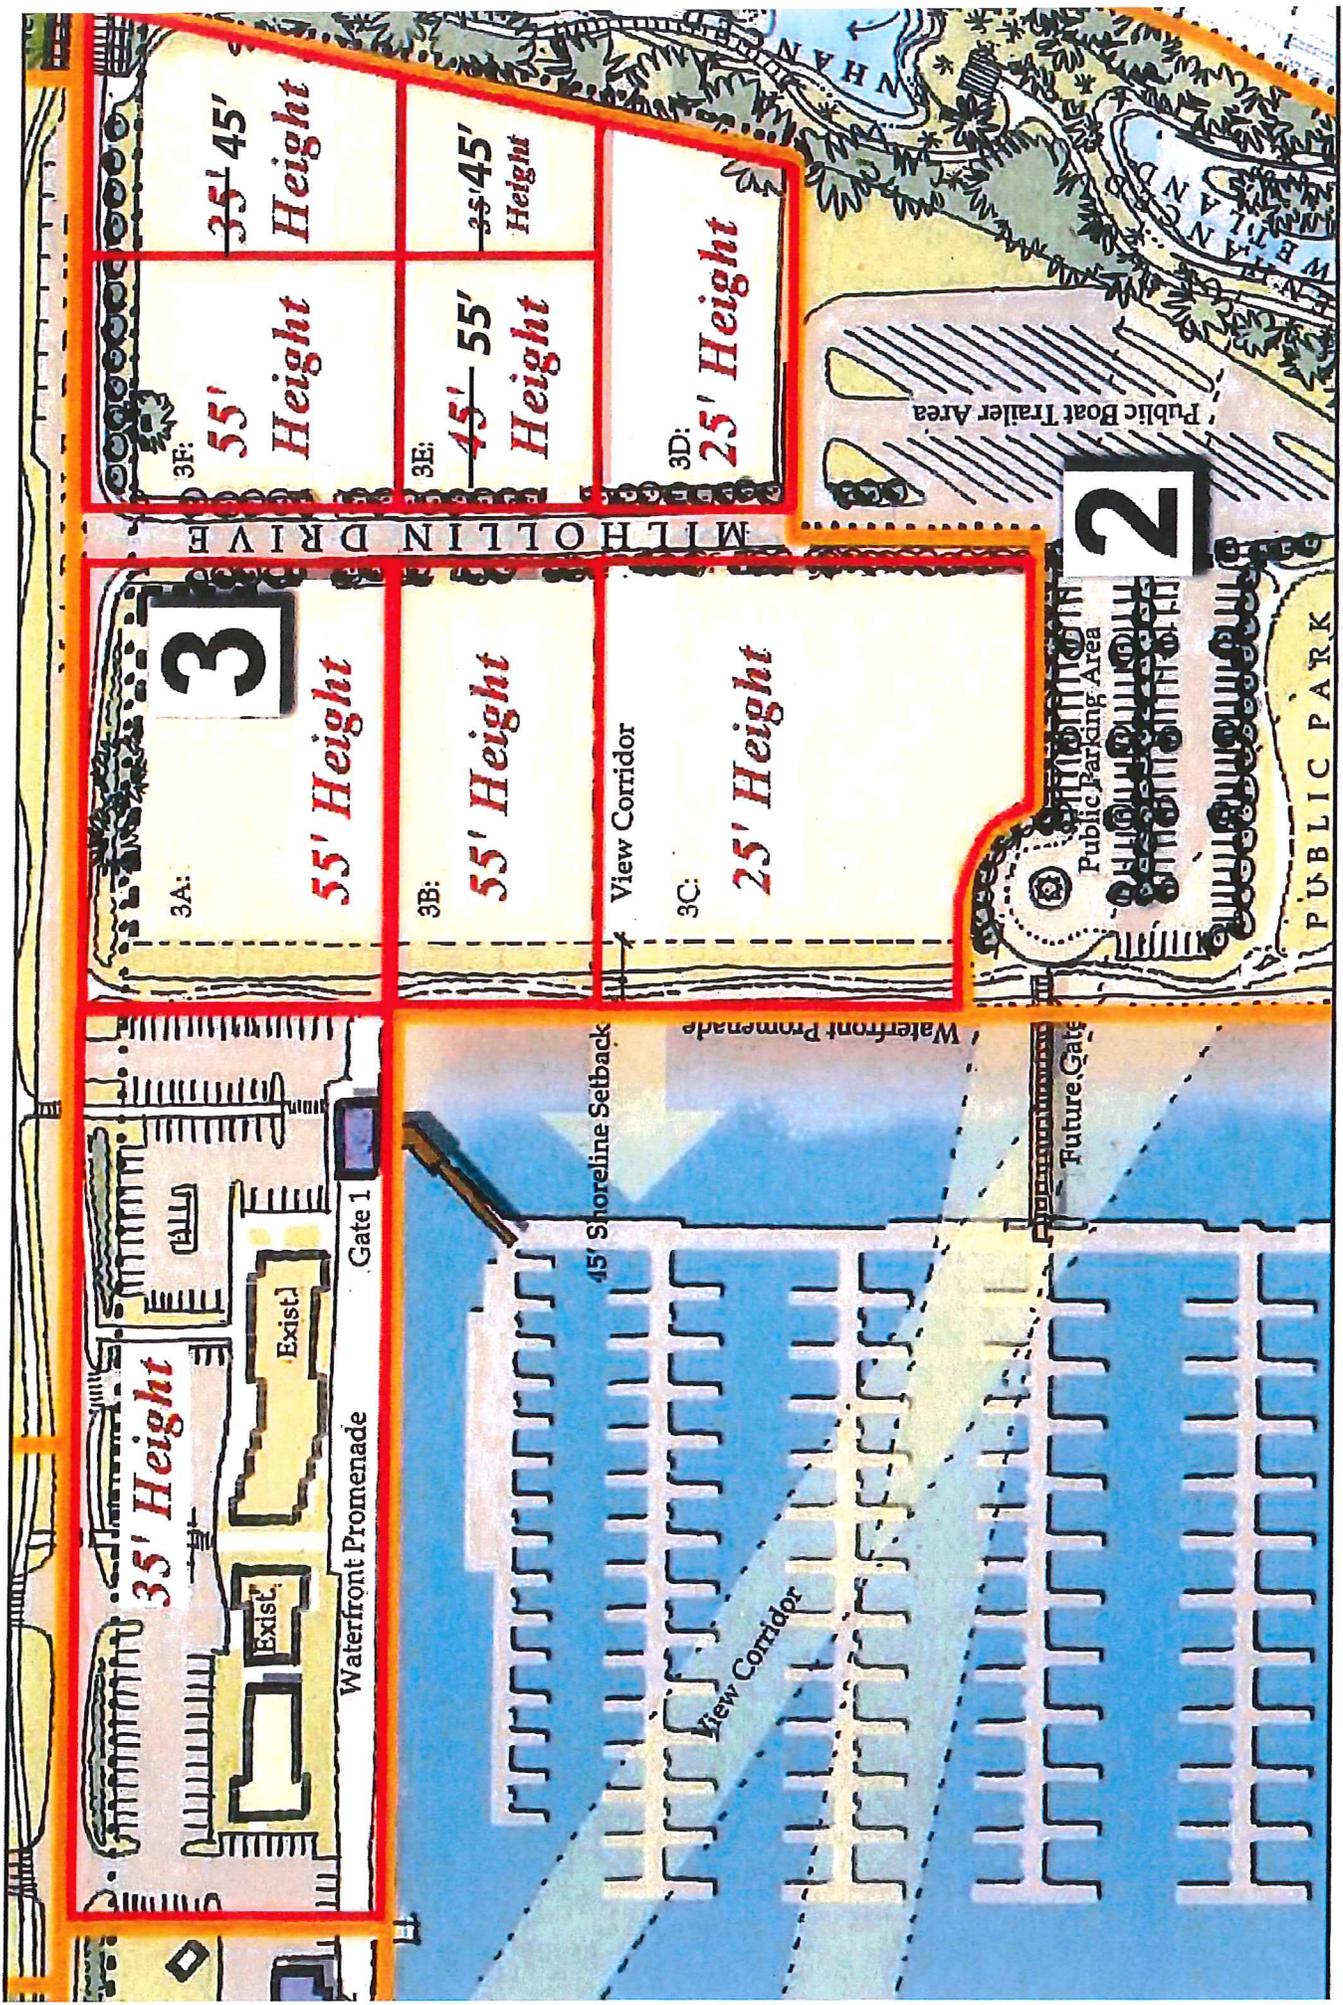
Planning Area 3 – Mariner Village Conceptual Plan – Height Limits
